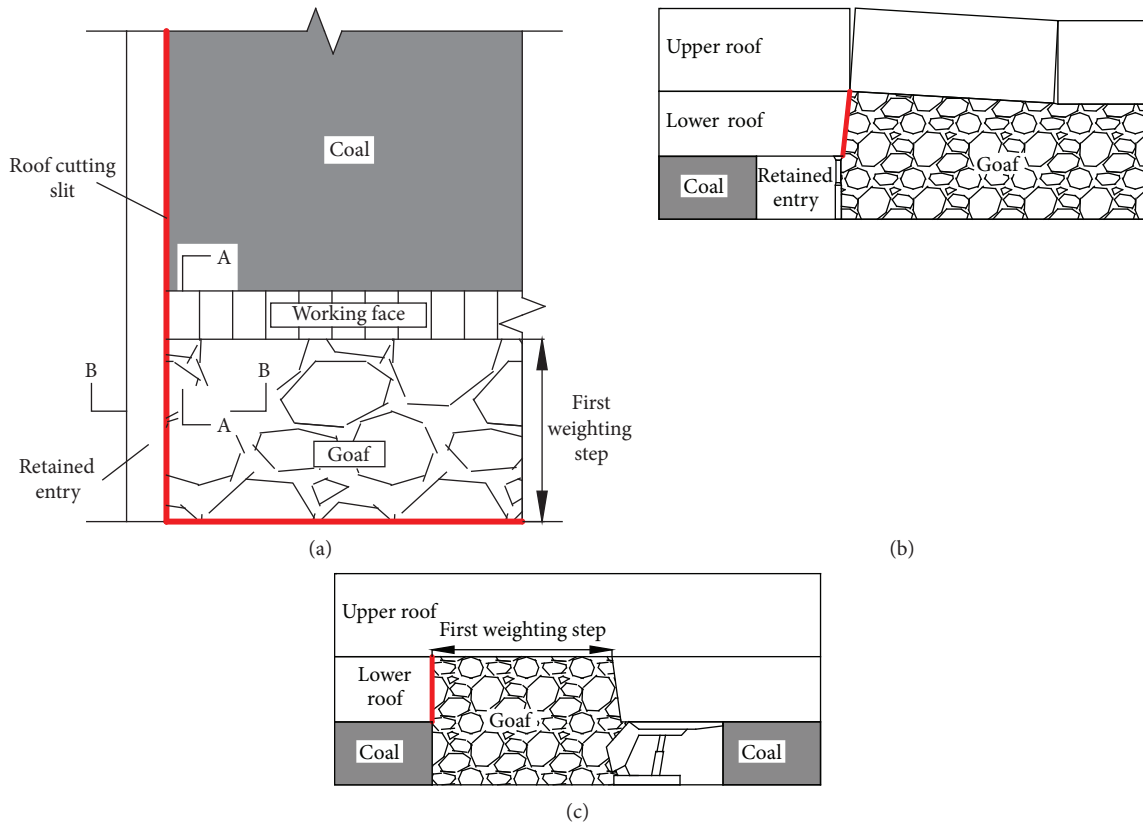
Schematic diagram of roof cutting in retained entry and open-off cut: (a) plane of roof cutting in retained entry and open-off cut; (b) section map of entry retaining roof cutting (section B-B); (c) section map of open-off cut roof cutting (section A-A).
